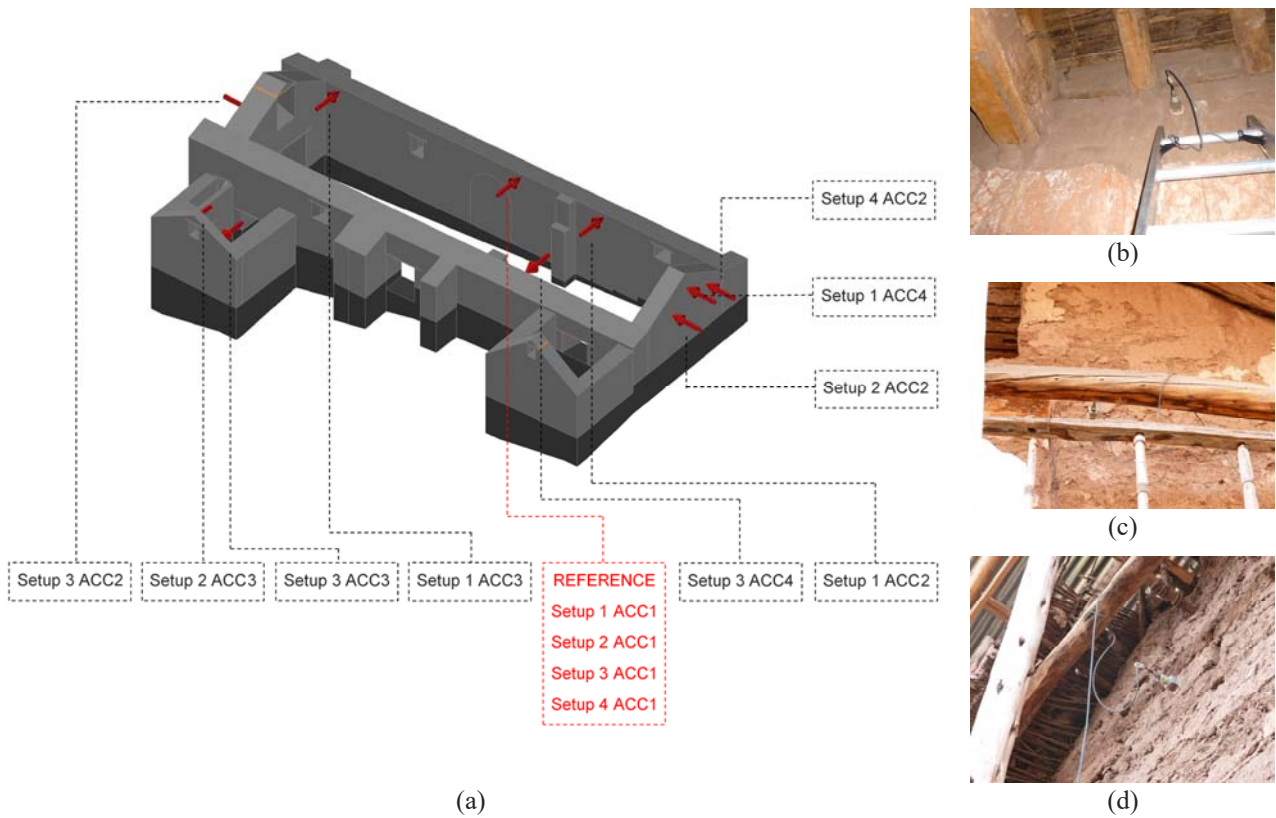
(a) Disposition of accelerometers in the performed setups at the nave and baptistery walls; (b) accelerometer near the wall plate of the south lateral wall, (c) accelerometer on the exterior cladding of the east façade, (d) accelerometer on the exterior cladding of the west façade.
